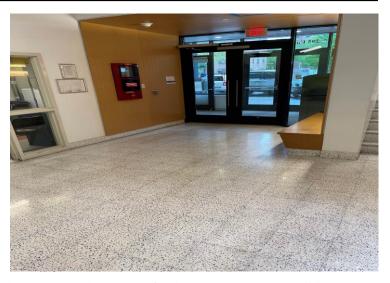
Interior flooring in the Tres Puentes East Building, facing west.
